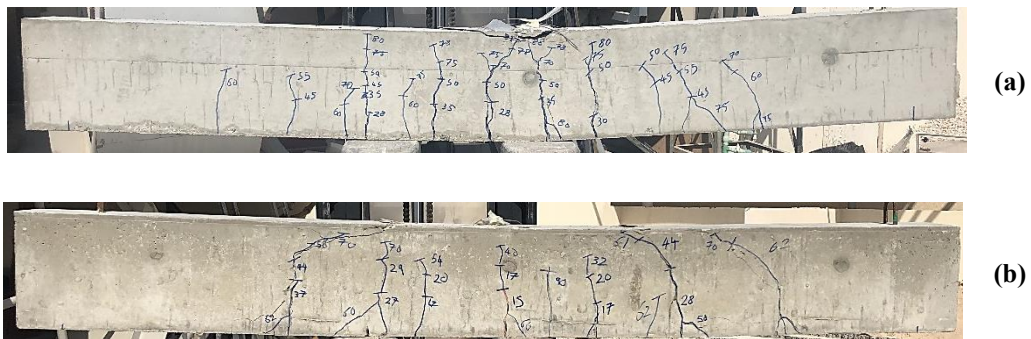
Cracking pattern for (a) Specimen C-S-2 and (b) Specimen C-F-2.
